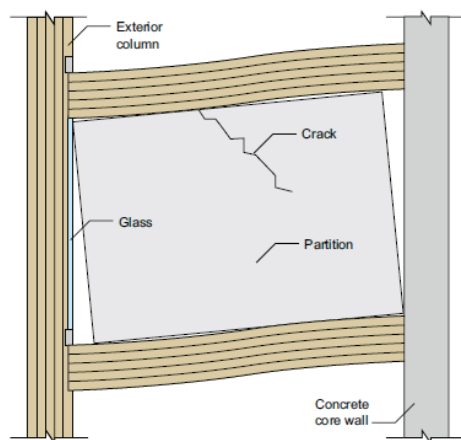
Effects of structure shortening on a glazed façade if differential movement is not accounted for in design and detailing
